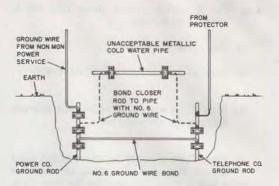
Unacceptable Water System or Building Ground (Non-Multigrounded Neutral Power System Grounded to Ground Rod)
